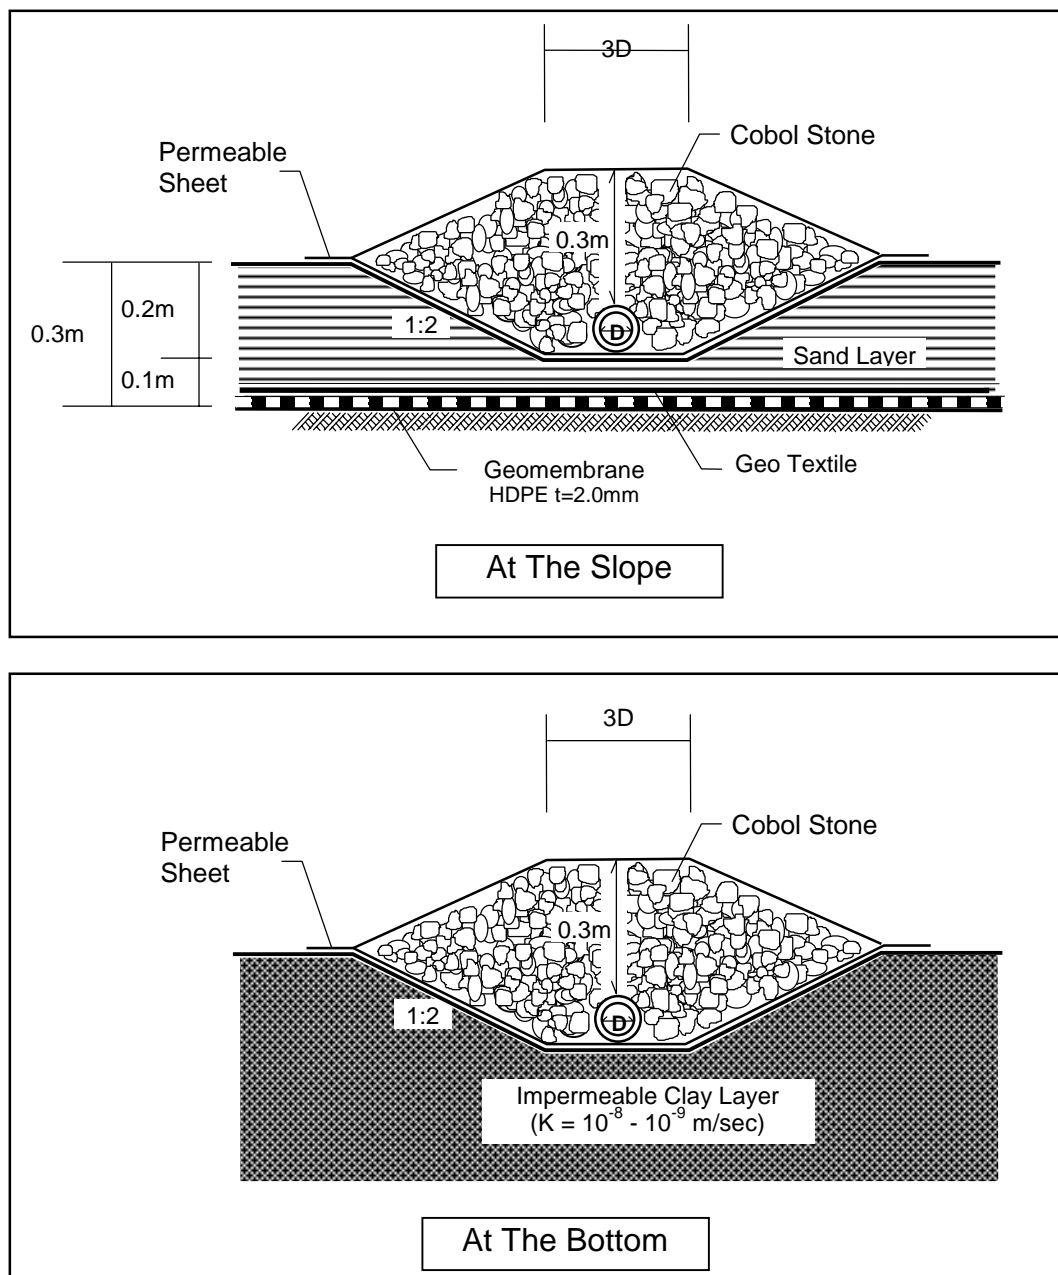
Typical Section of Leachate Collection Pipe & Main Leachate Drain
